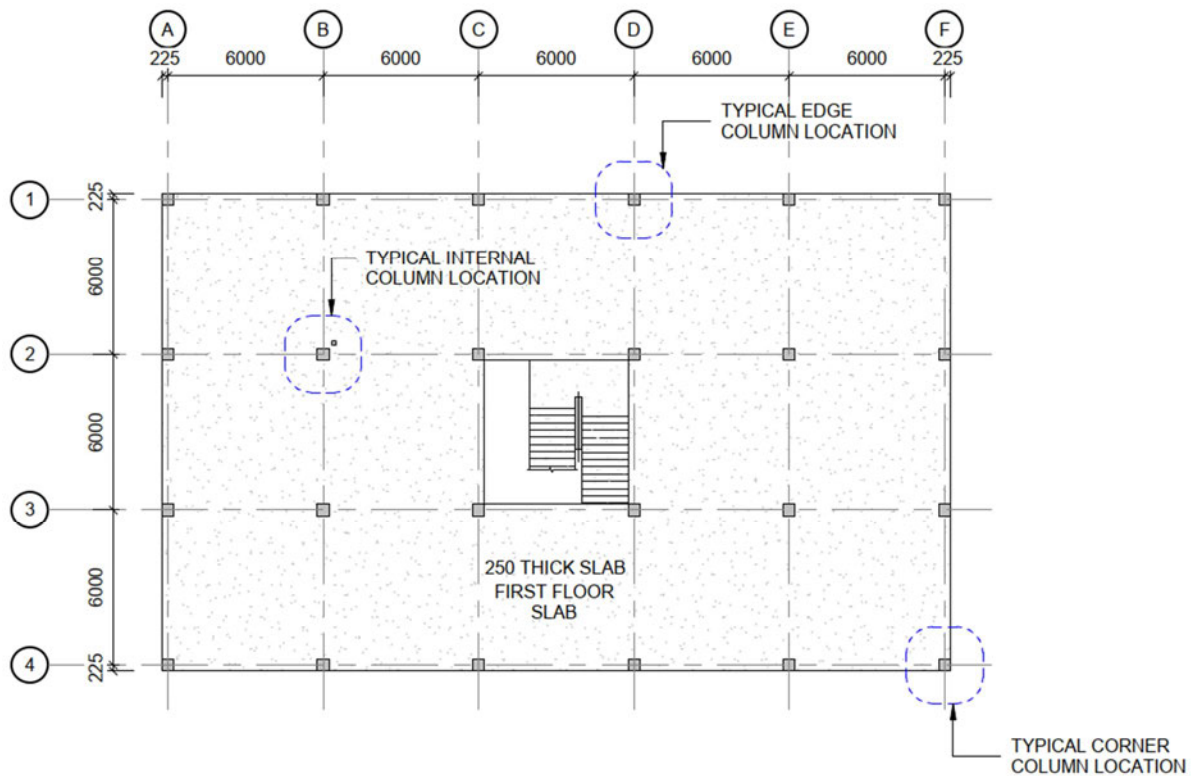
Floor layout indicating the typical punching shear locations to be checked.
